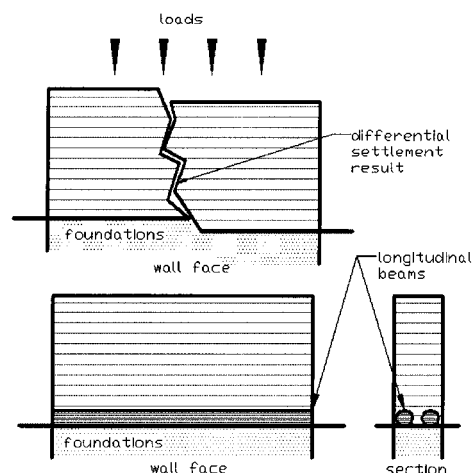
Longitudinal beams introduced in massive walls foundations to alleviate differential settlement.
